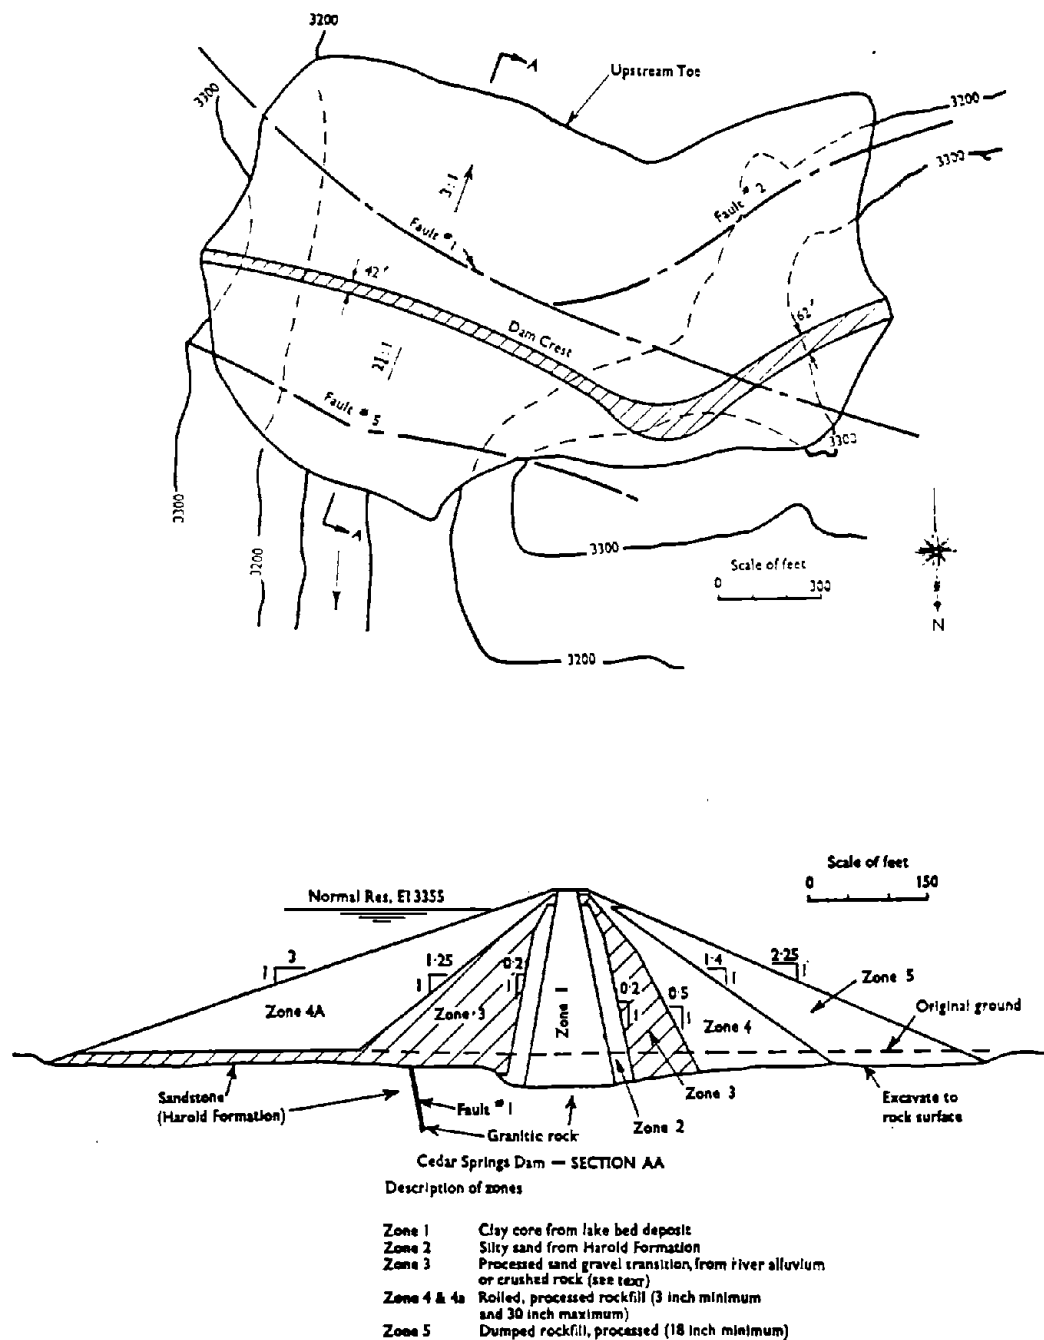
CEDAR SPRINGS DAM: PLAN VIEW AND TYPICAL CROSS SECTION WITH FAULT LOCATIONS (after Sherard et al., 1974)
